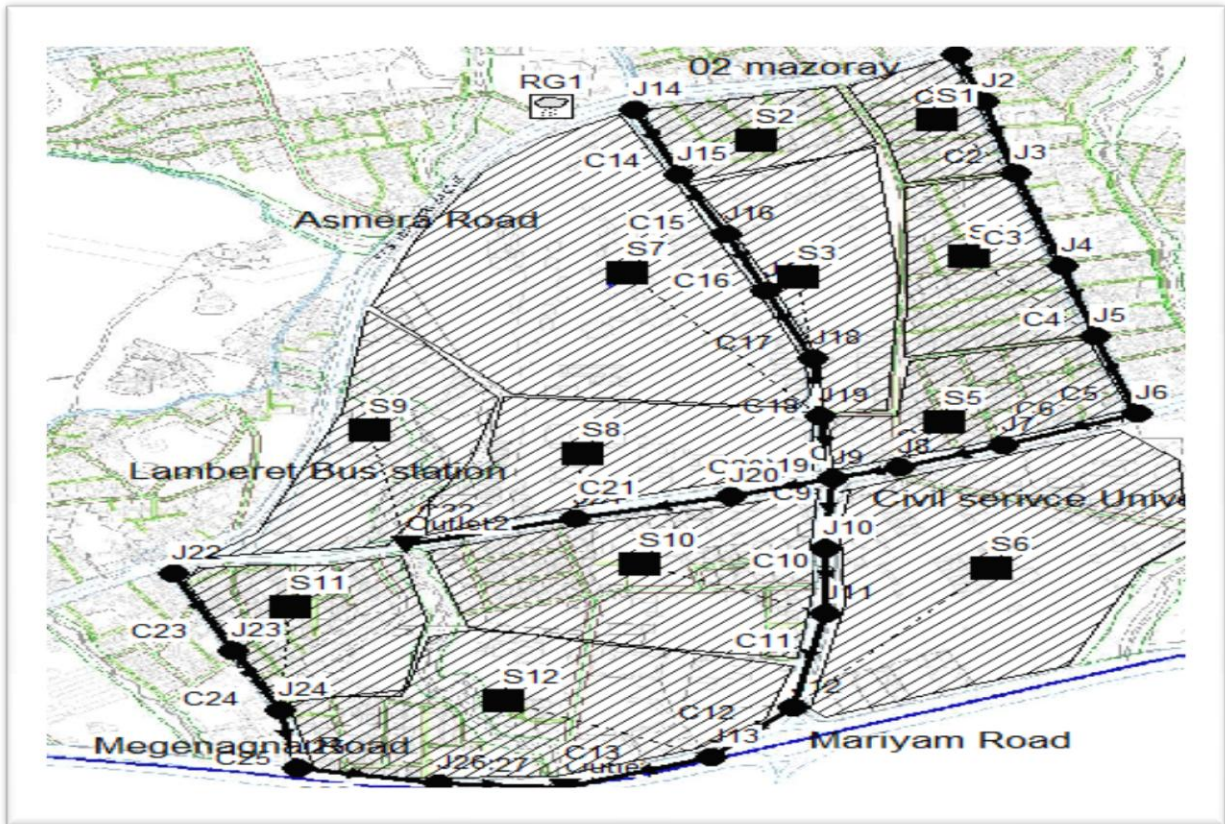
Zone 3 Schematic diagram showing conduits, junctions and sub-catchments pipe flow-based drainage system layout.
